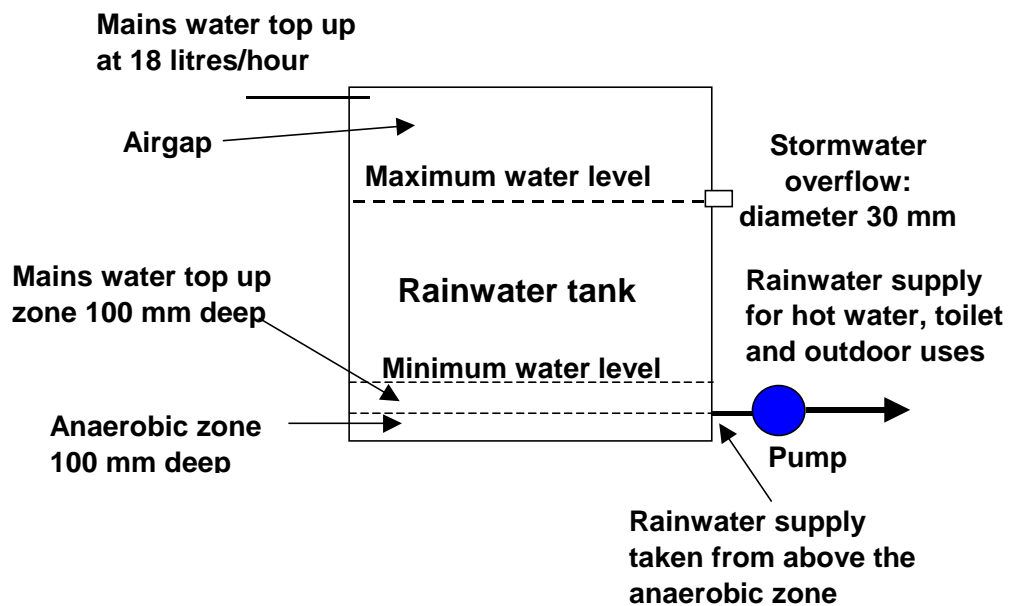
Design details for a rainwater tank with additional provision for stormwater management
